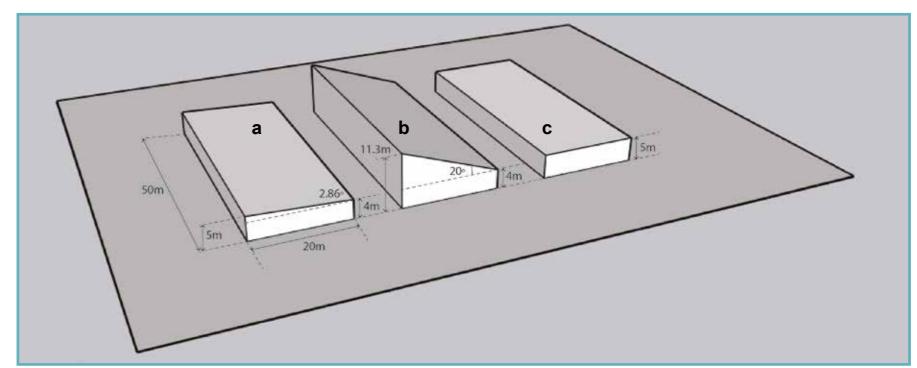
Exploration of roof forms, using the Control Building as an example. A= typical monopitch roof angle, B= 20 degree angle, suitable for PV installation, C= flat roof, suitable for green roof installation.
